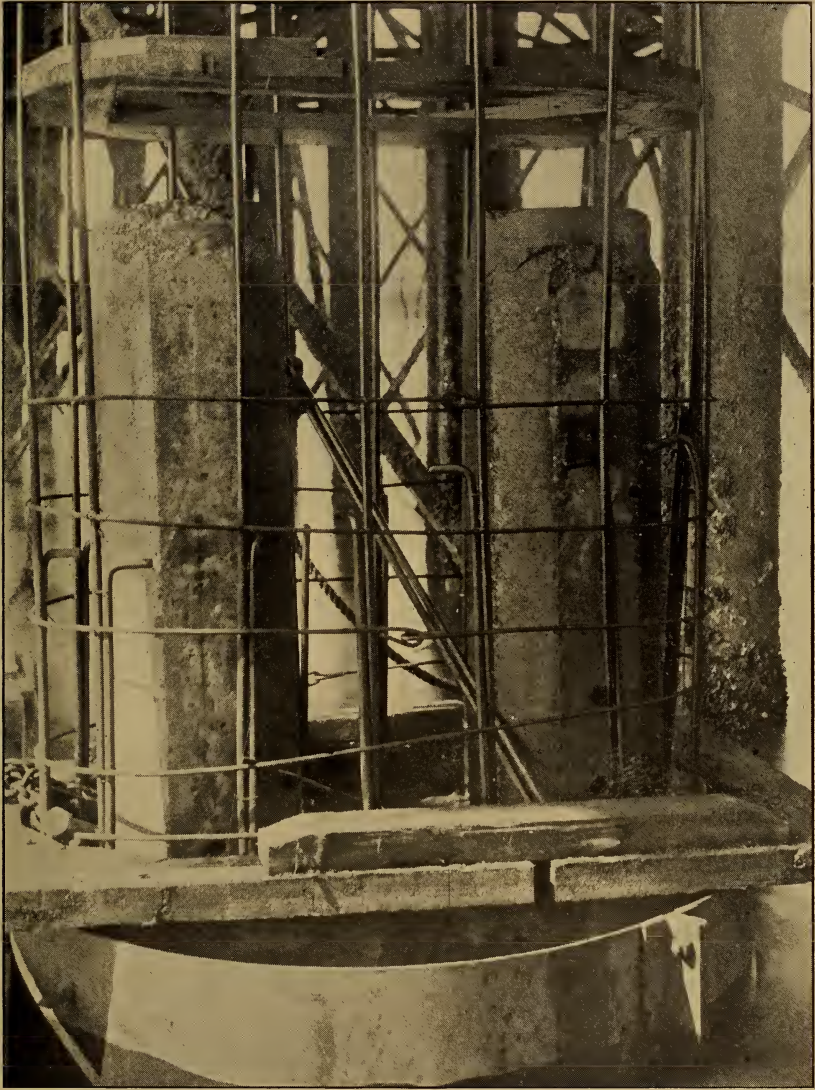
DETAILS OF THAMES HAVEN RECONSTRUCTION, SHOWING THE HOOPED REINFORCEMENT OF THRUST MEMBERS.
